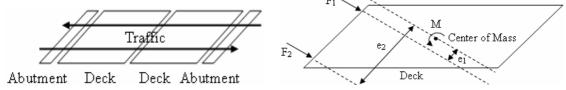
Example Skewed Bridge (a) Overhead View (b) Eccentric Forces on Deck
